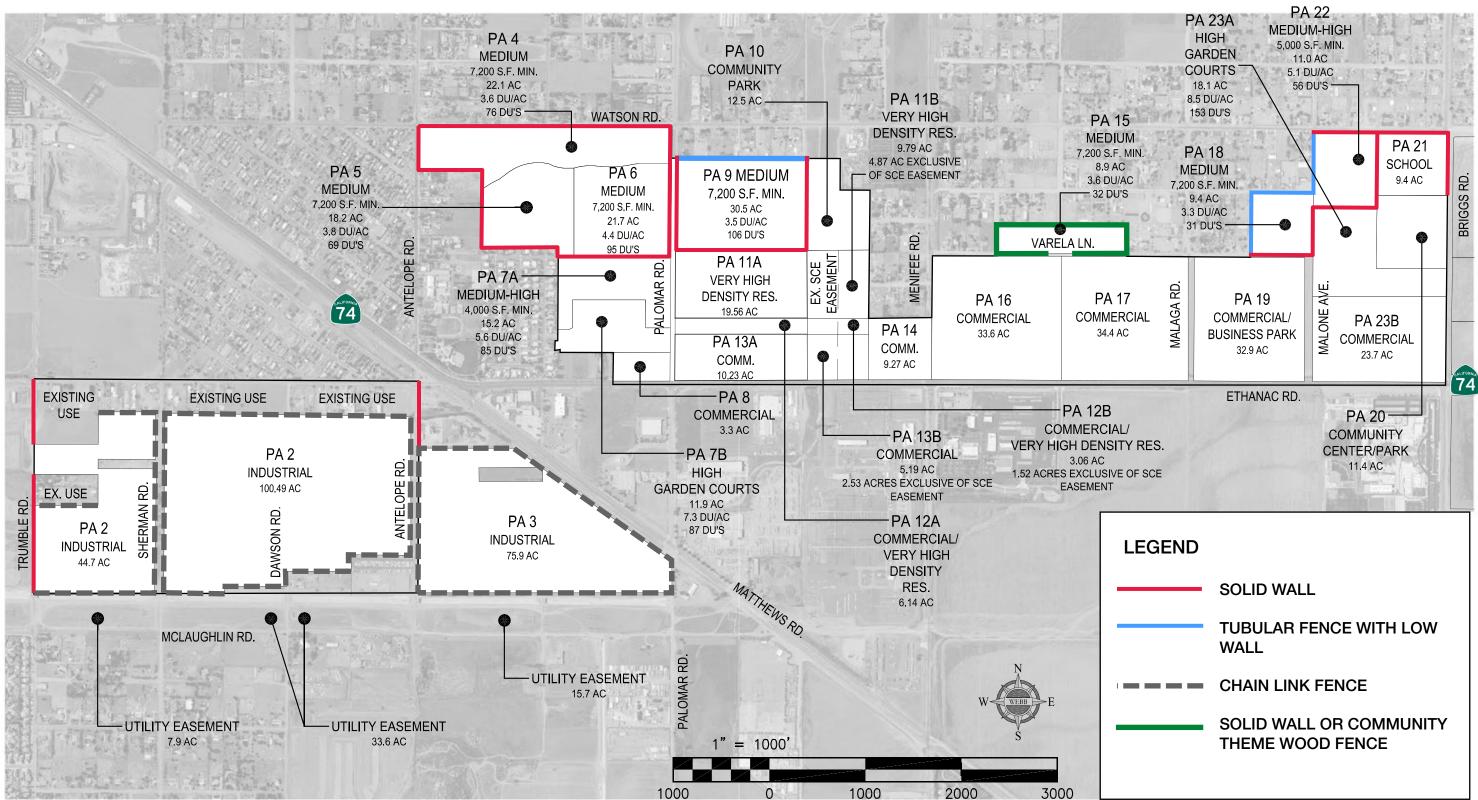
CONCEPTUAL LANDSCAPE PLAN
